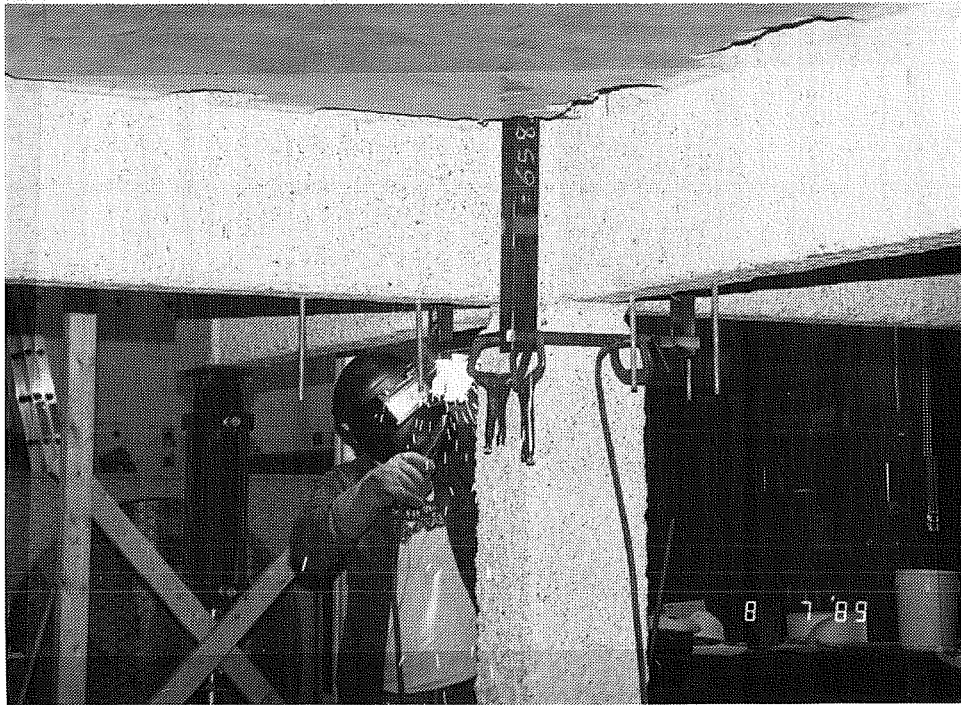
Jacketed Specimens - Assemblage of Joint Confinement Cage
